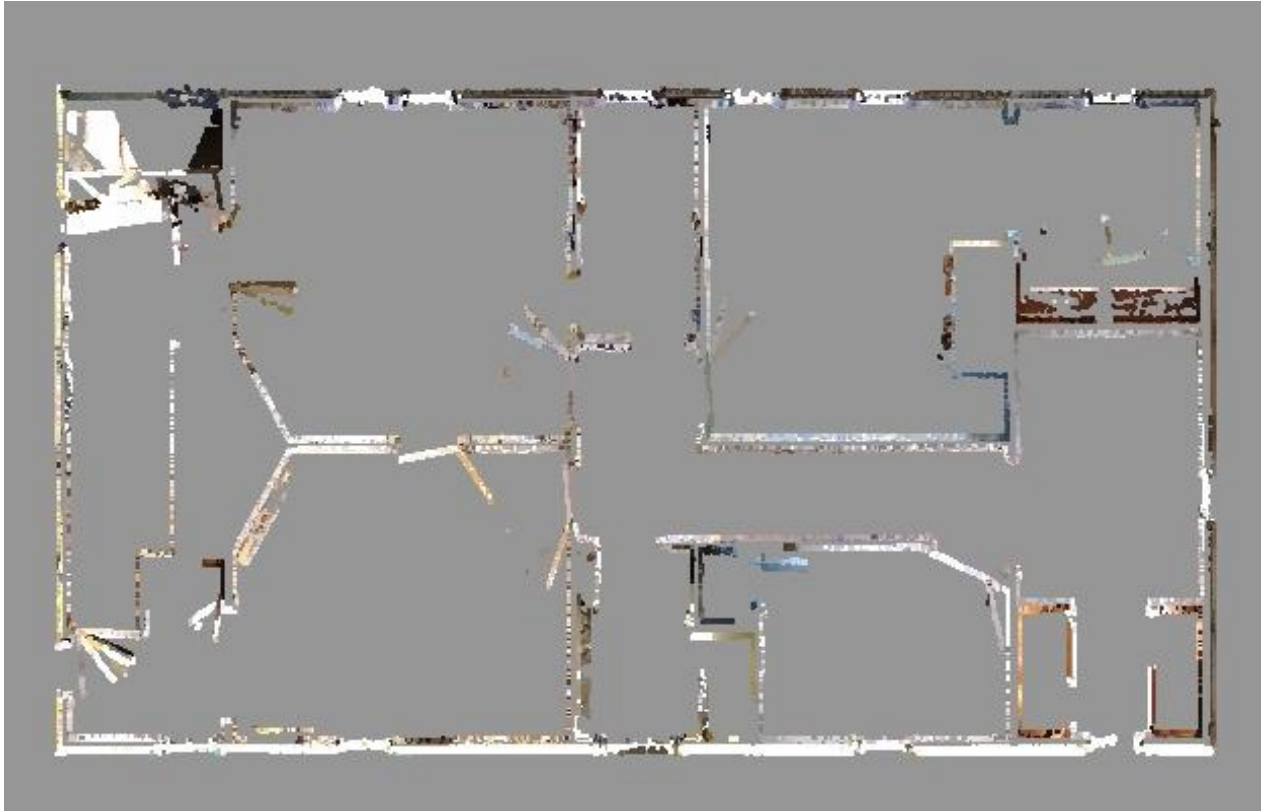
The second-floor plan of Sylvania, with north facing up, generated by 3D data. A central passage, which has since been divided into bathrooms, is visible running north-south in the center of the plan.
